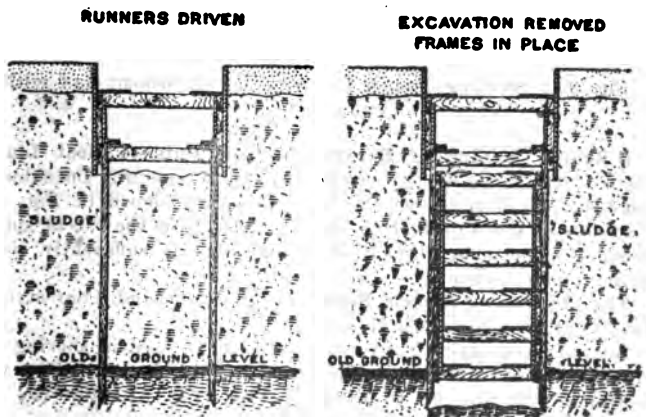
Runners Driven, and Excavation Removed Frames in Place.
